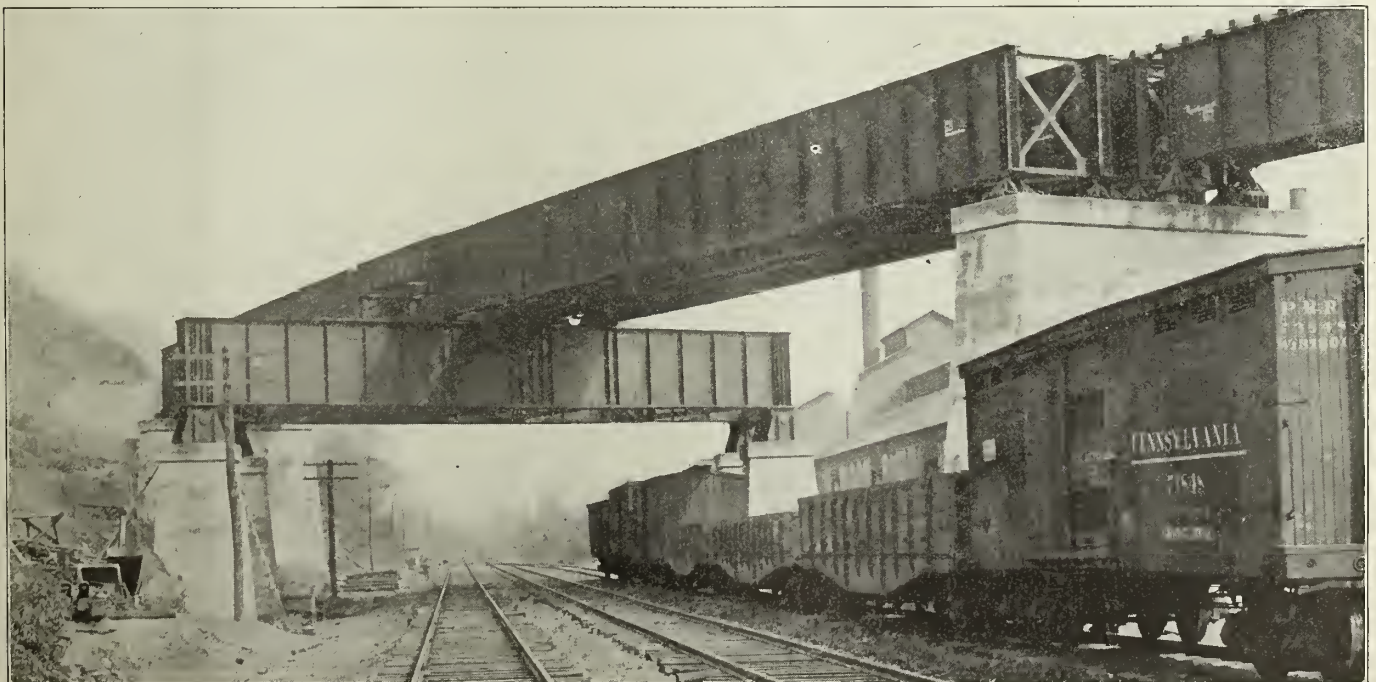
Bridge at Station 820 with Steel Work Erected.
